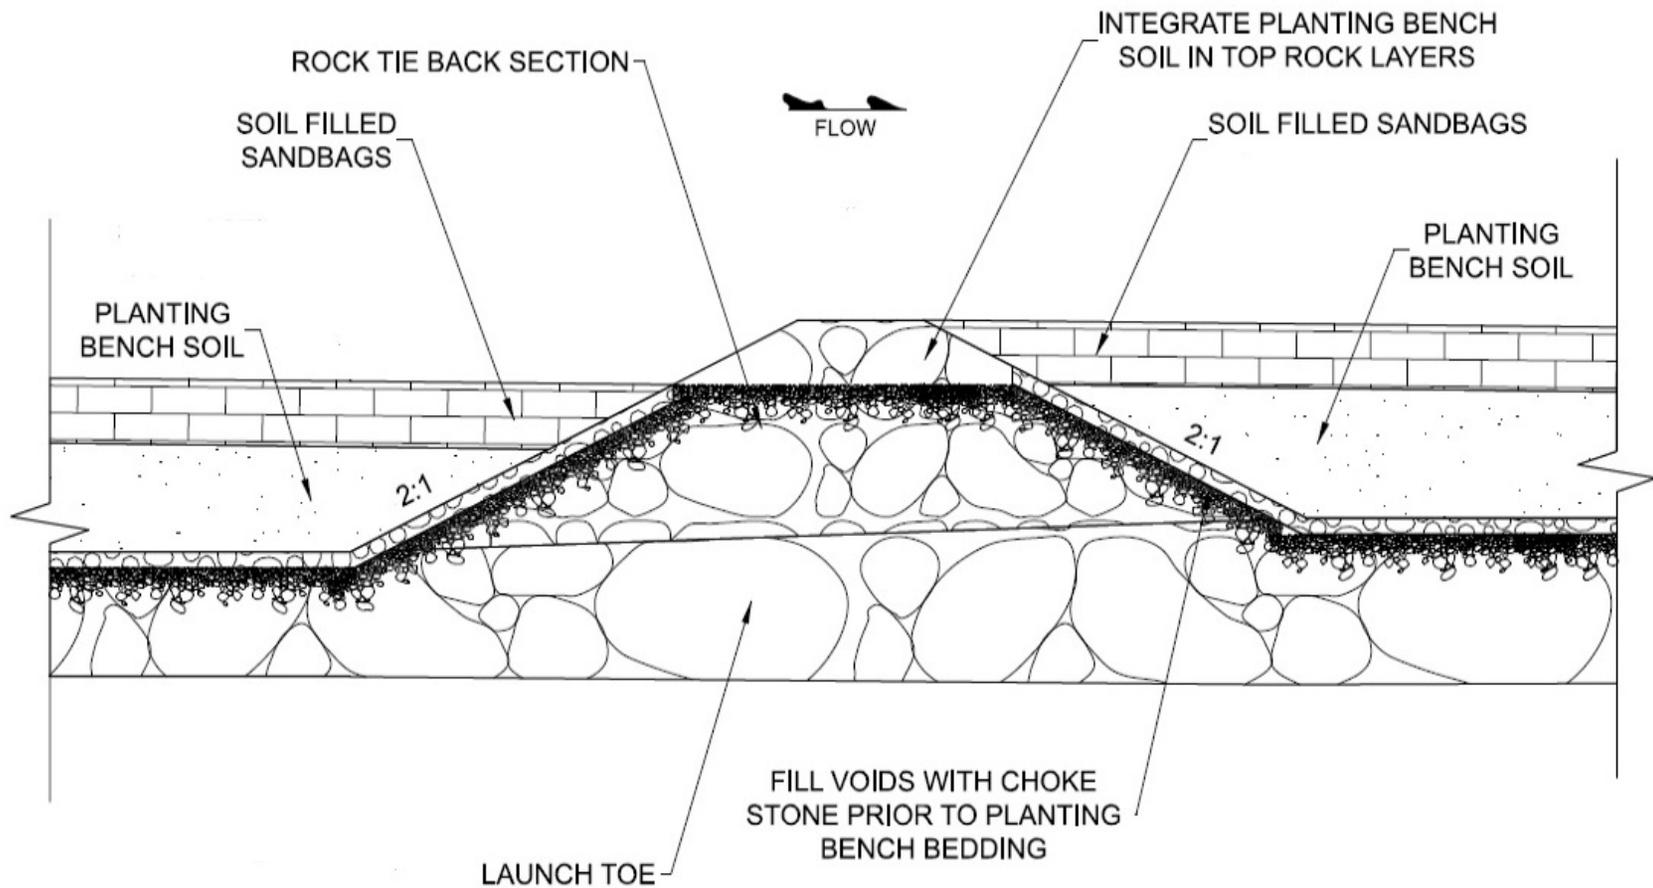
Planting Bench with Launchable Rock Toe and Buried Rock Tie-Back
